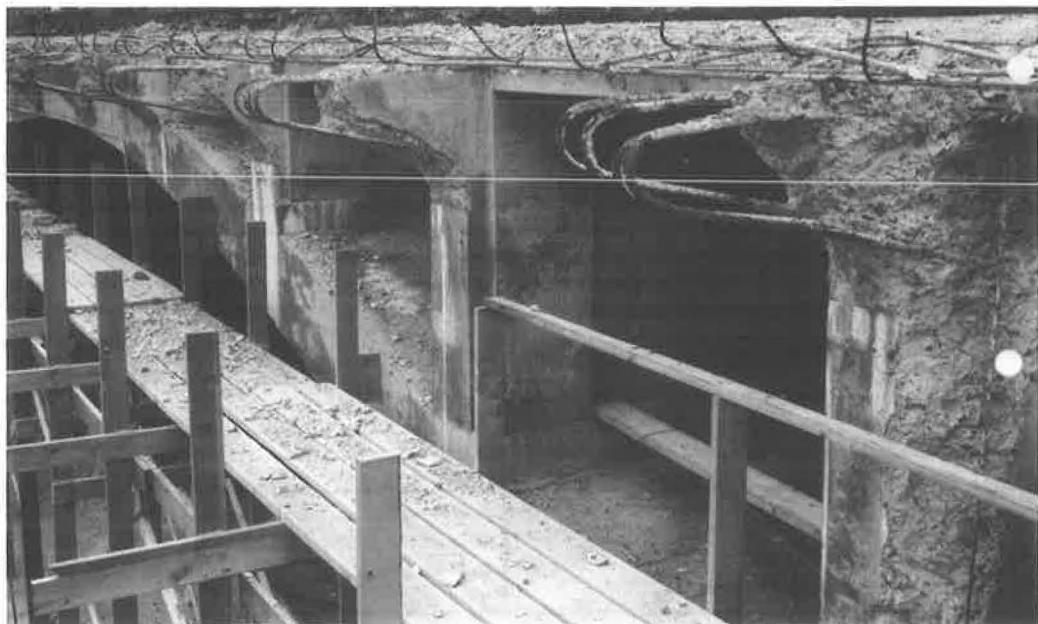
Glens Falls Bridge concrete arches, deteriorated concrete being removed.
